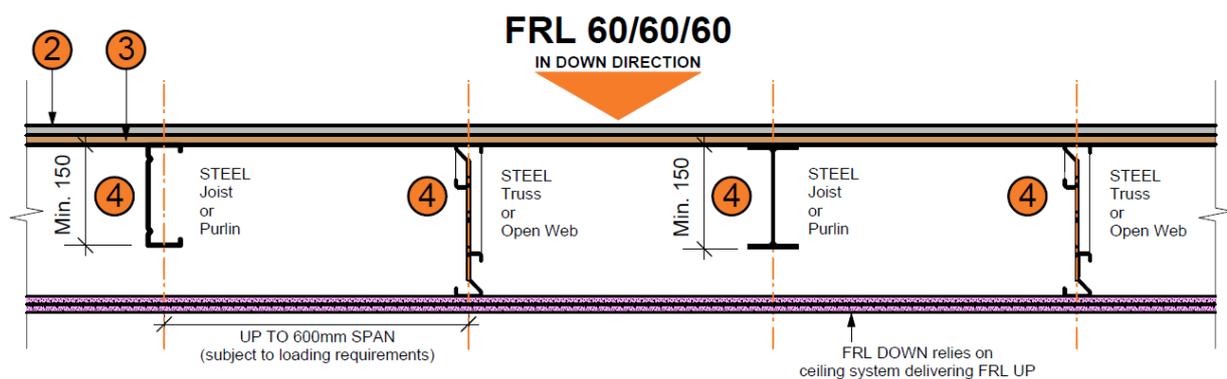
Steel frame floor/ceiling system with 1 × 19 mm INEX>FLOOR19
